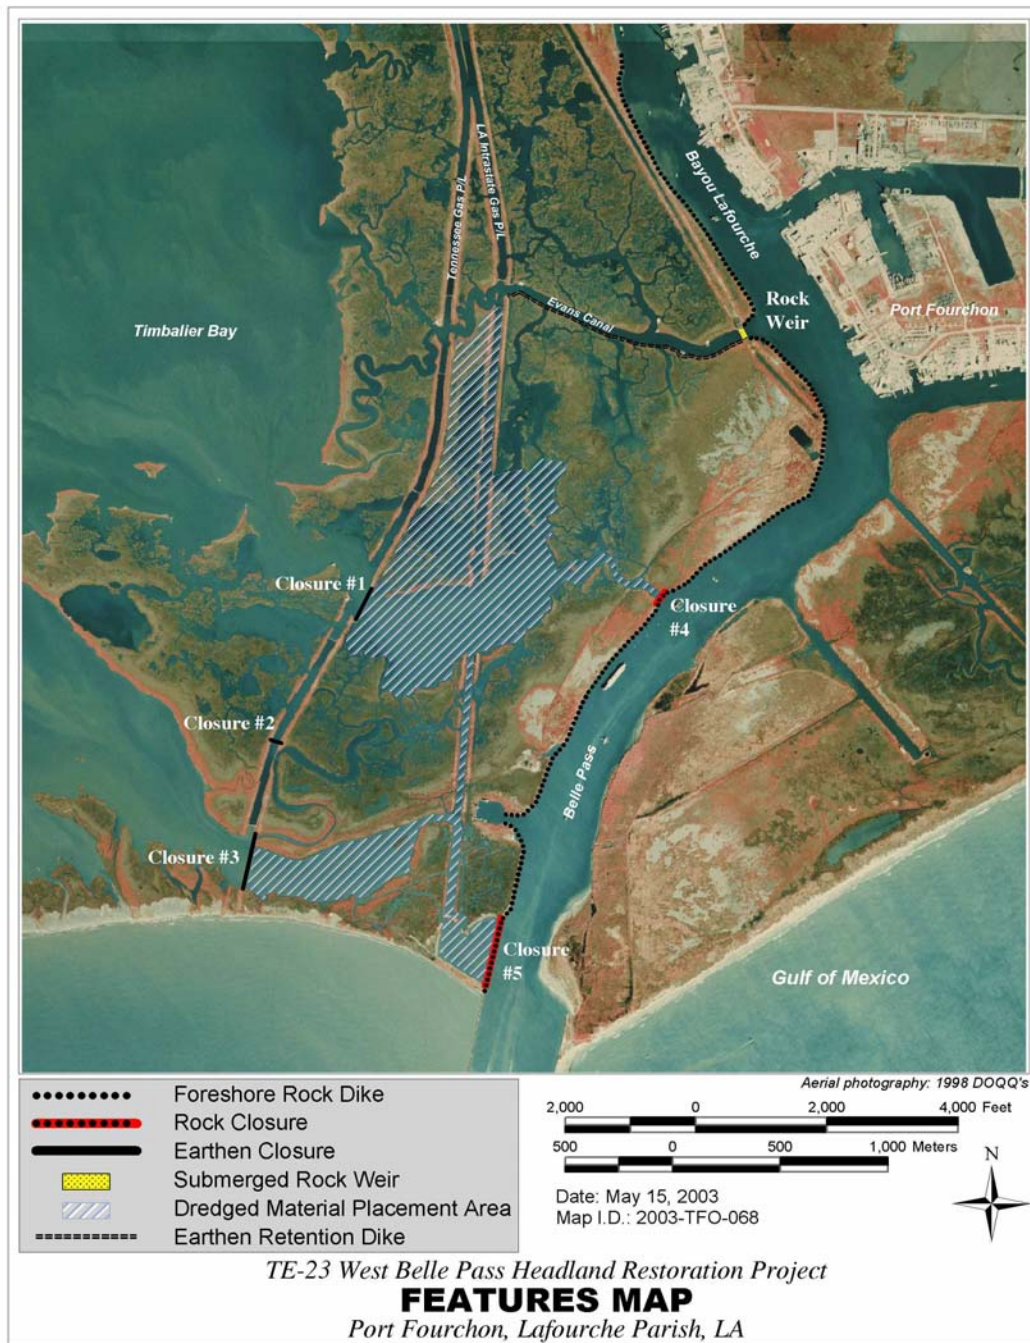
Location of the West Belle Pass Headland Restoration (TE-23) project features.
